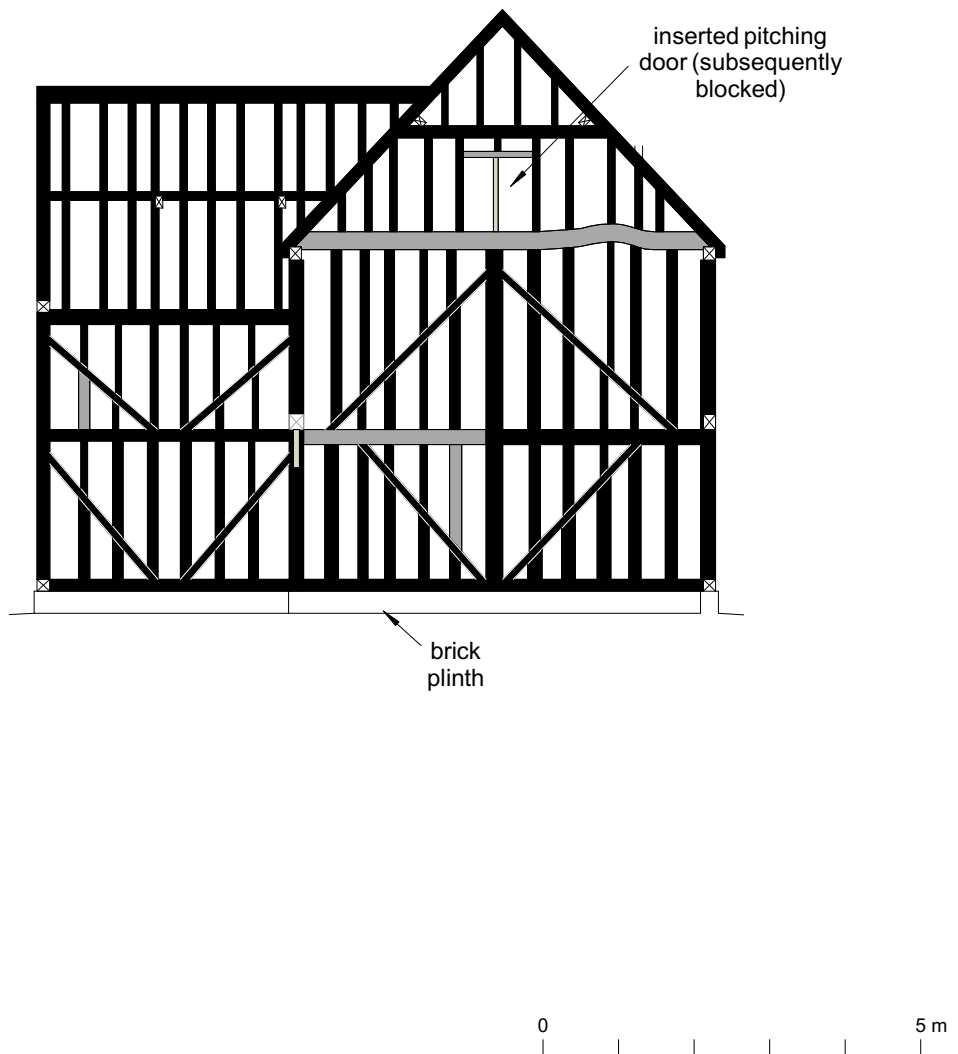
Frame drawing of the south-west wall to the Church Barn, indicating the locations of original, re-used and replacement timbers.
